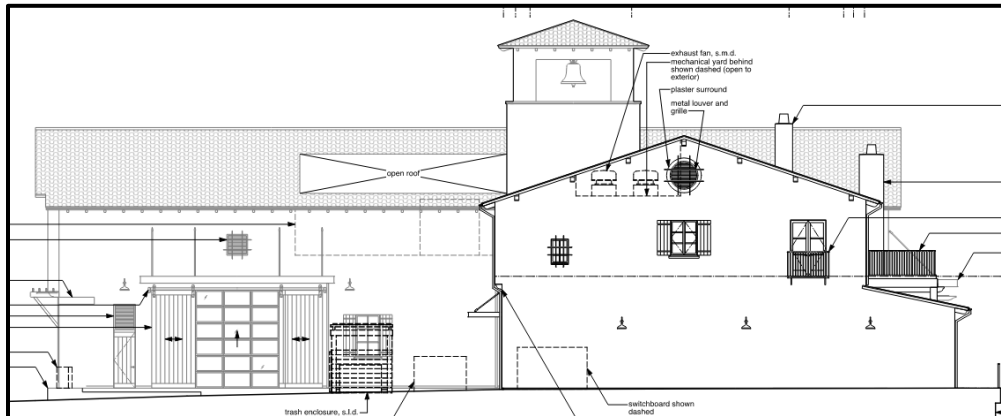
PG&E Elevation – Approved (Attachment F, Sheet A3.02)
